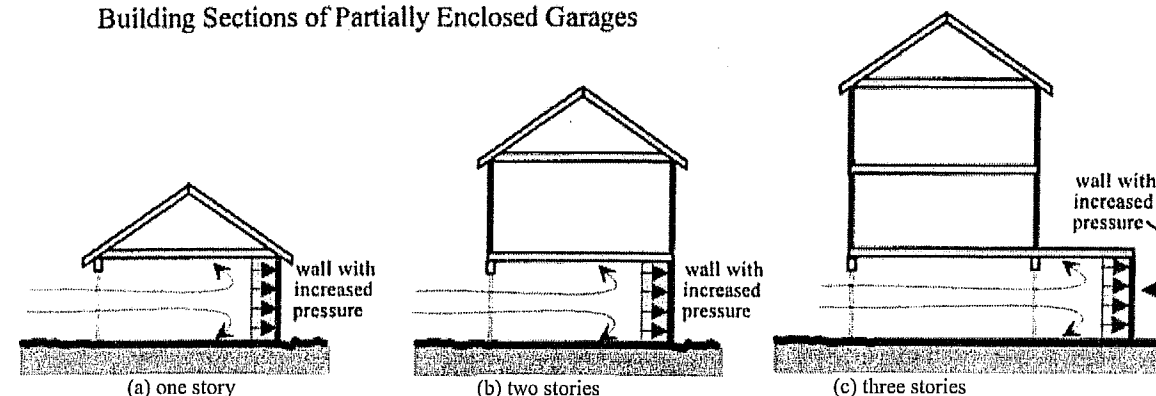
Schematic showing airflow and pressures on walls of partially enclosed garages in one-, two- and three-story buildings.
